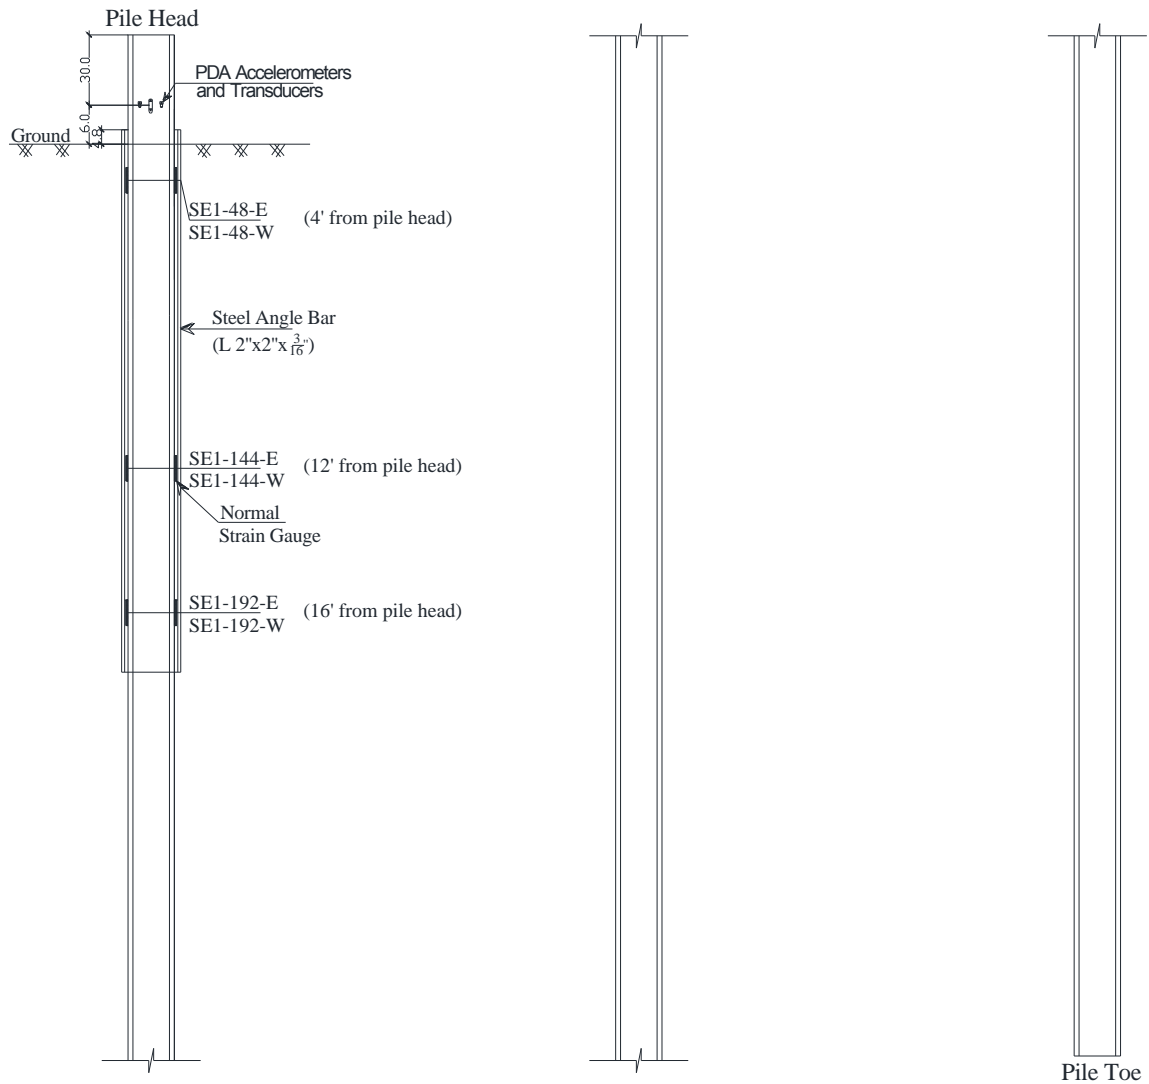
An Elevation View of SE1 and SE2 Showing the Locations of Instrumentation
